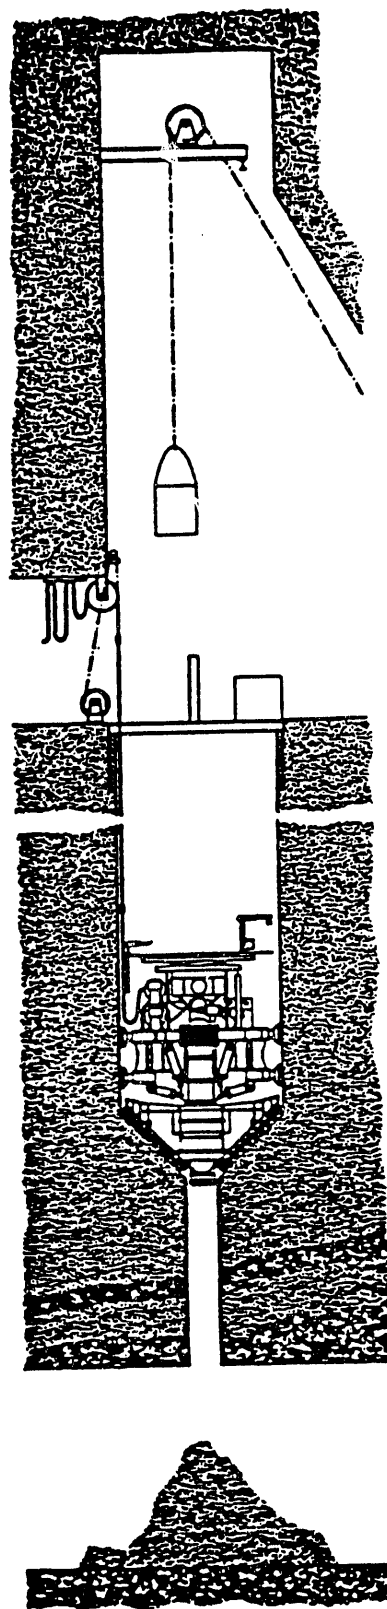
Schematic Drawing of a V-Mole in Operation, Courtesy of Wirth GmbH
